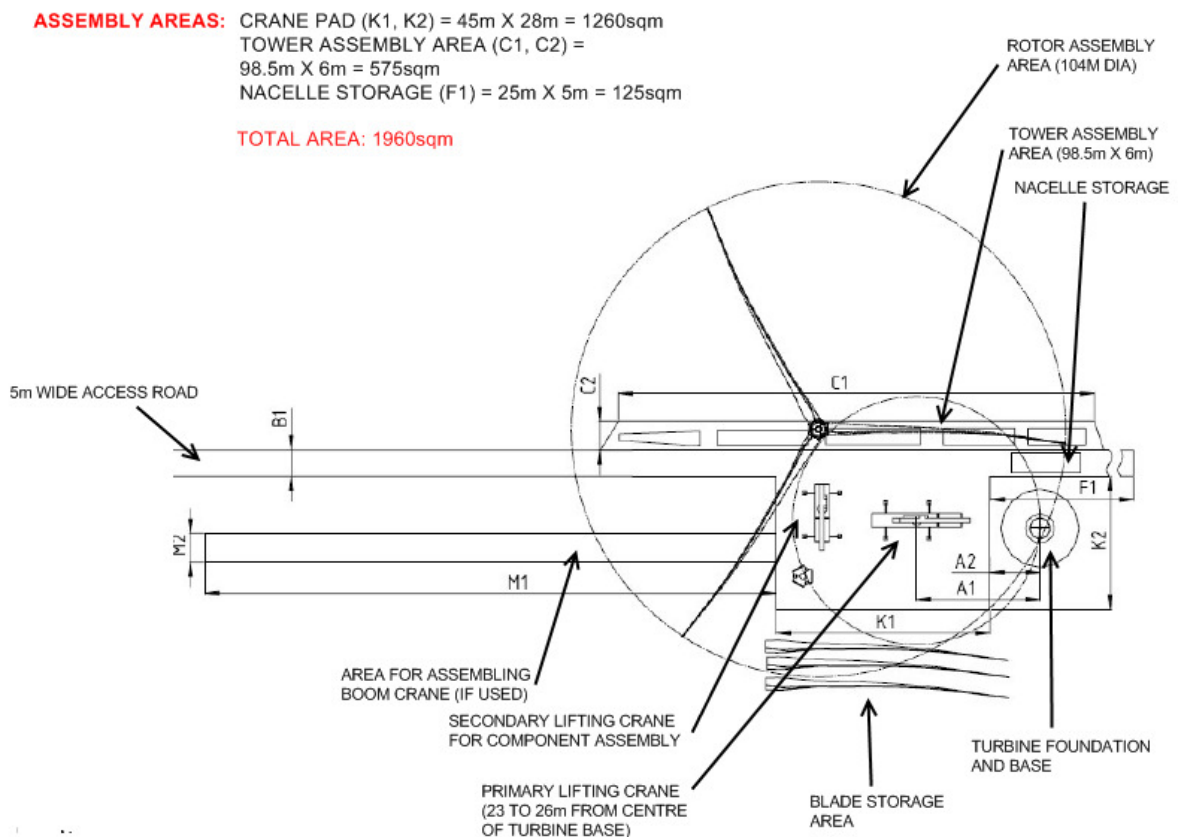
Turbine Assembly Area and Crane Pad Requirements
